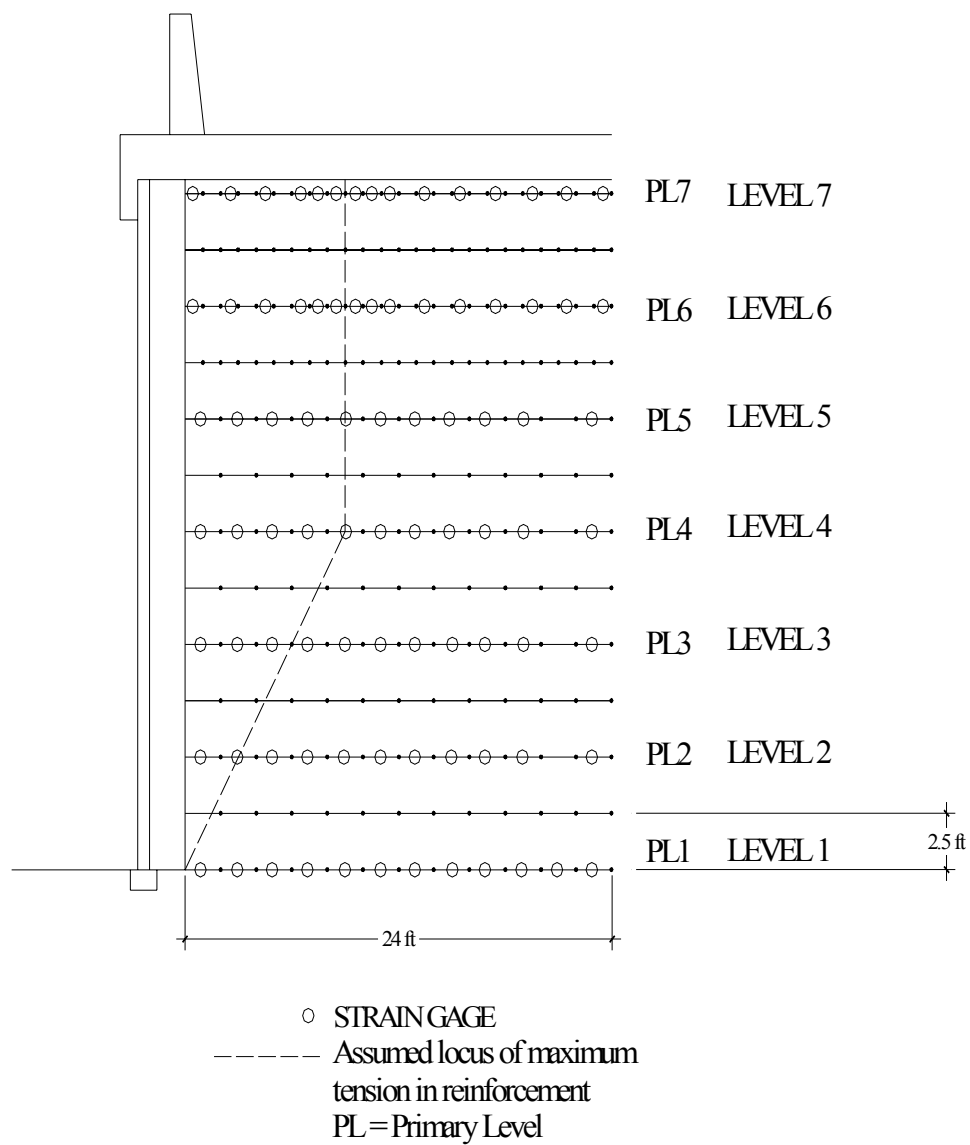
Elevation view of Wall R-346-1C with primary reinforcement only.
